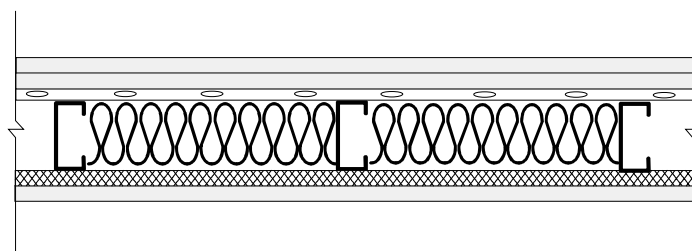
Sketch showing the location of the 11.7 mm thick OSB structural panel used in steel-framed assembly TLA-99-135. The 1220x2440 mm structural panels were installed vertically and fastened to the studs using #8 wafer-head-square wood-to-metal self drilling screws spaced 152 mm along edges and 305 mm in the field. Other construction elements are unchanged from Figure A-1.
